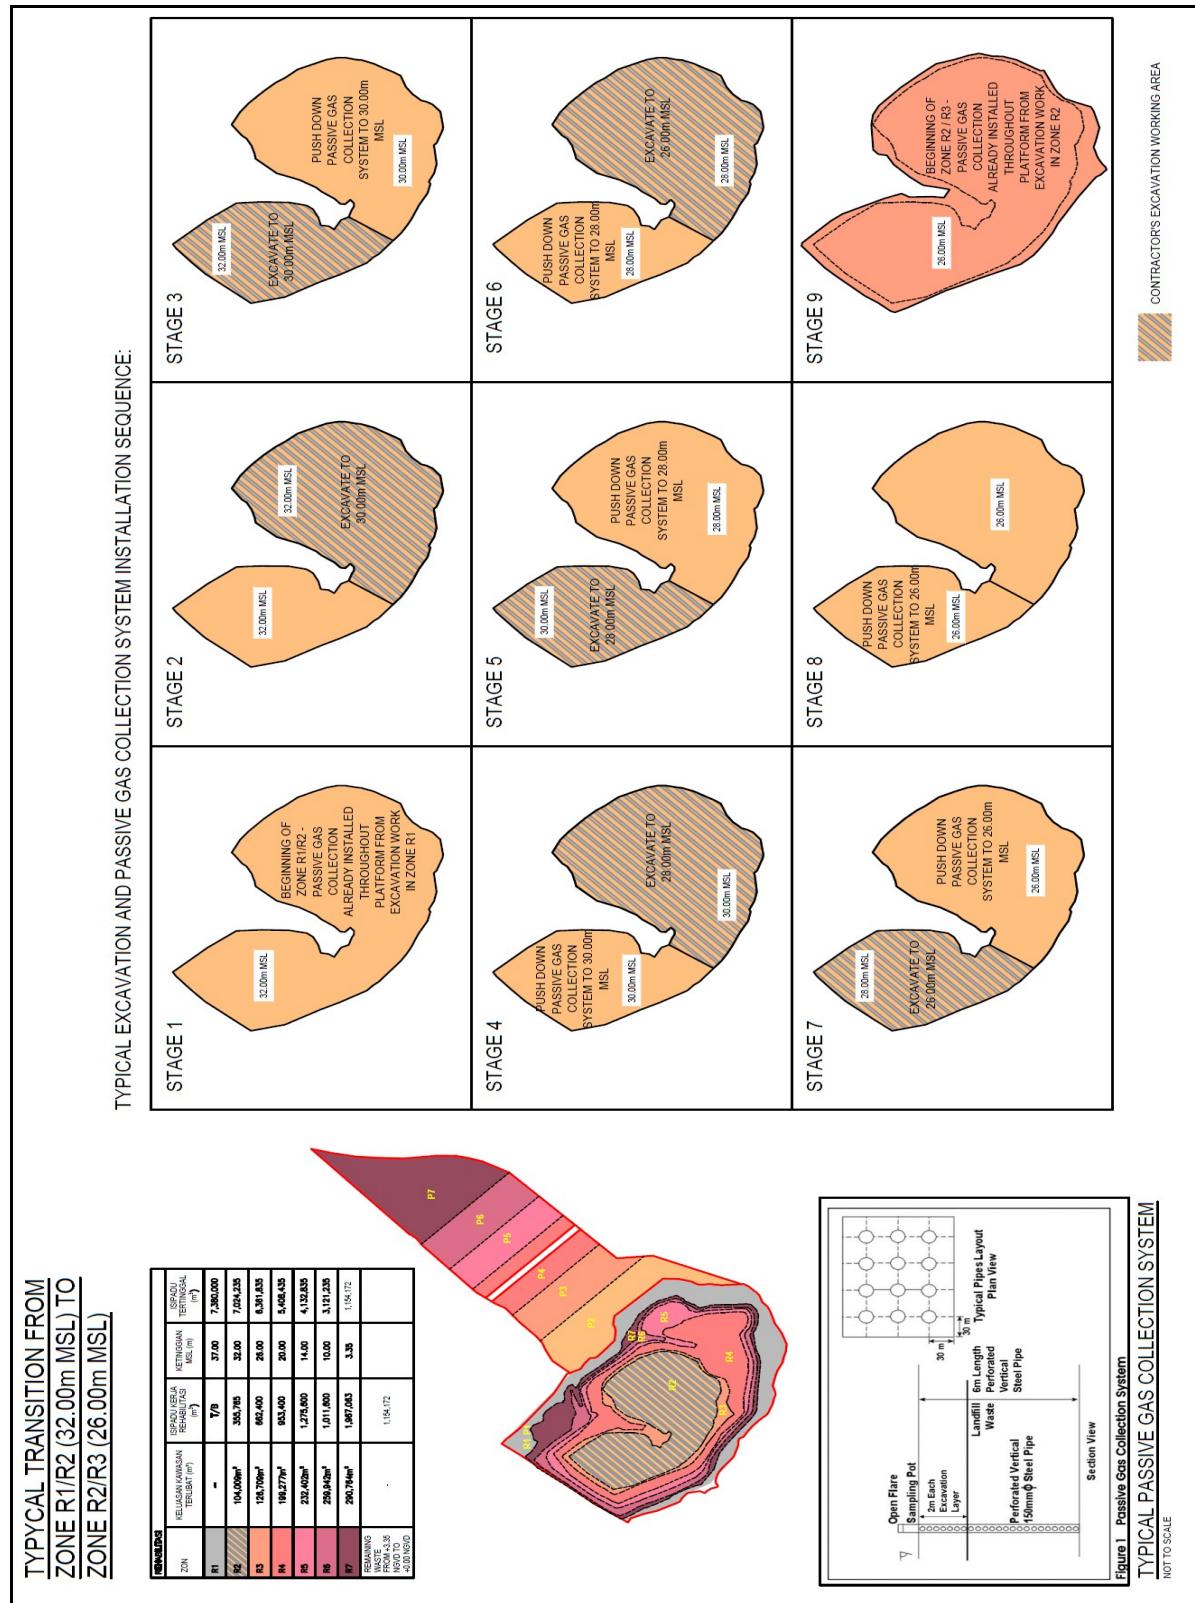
Typical Excavation And Passive Gas Collection System And Installation Sequence
